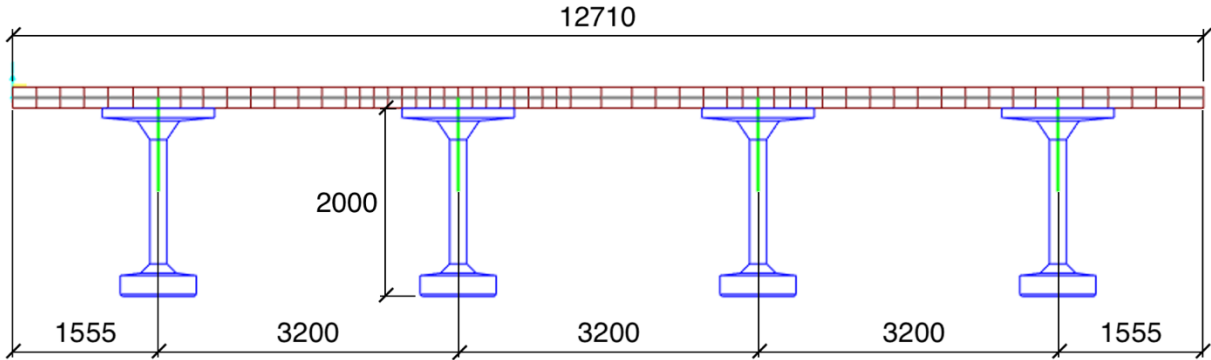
Extruded cross-section view of the bridge FE model (all dimensions in millimeters).
